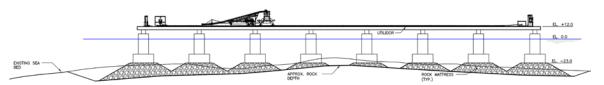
Elevation, Option 2 for Steensby Island Bridge (see Appendix A)
